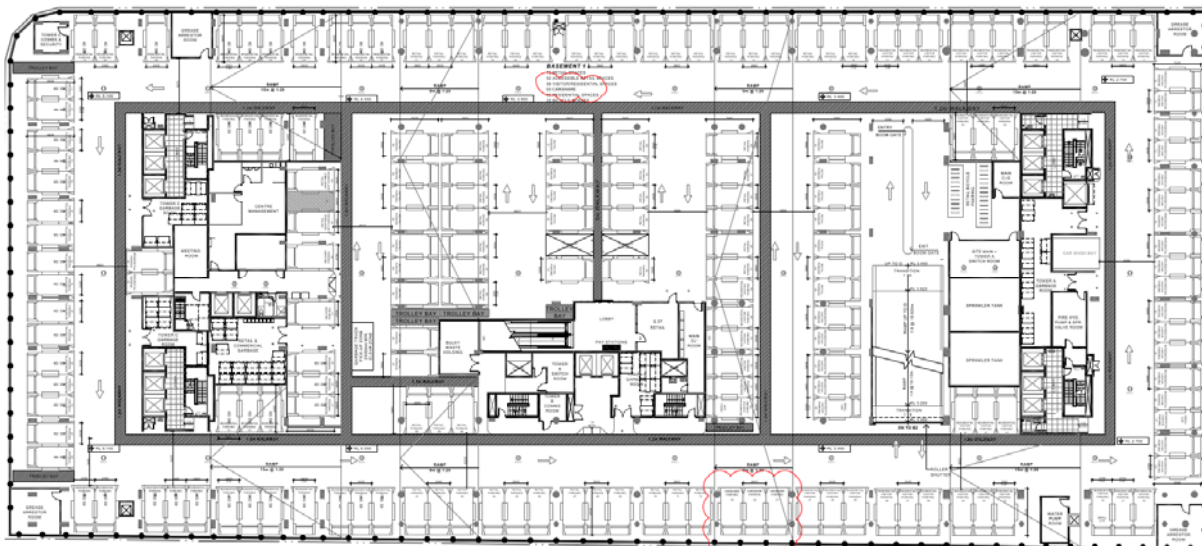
Proposed basement level 1 plan under DA/961/2015/B. Source: Team2 Architects, Revision H-b, dated 14 December 2018
